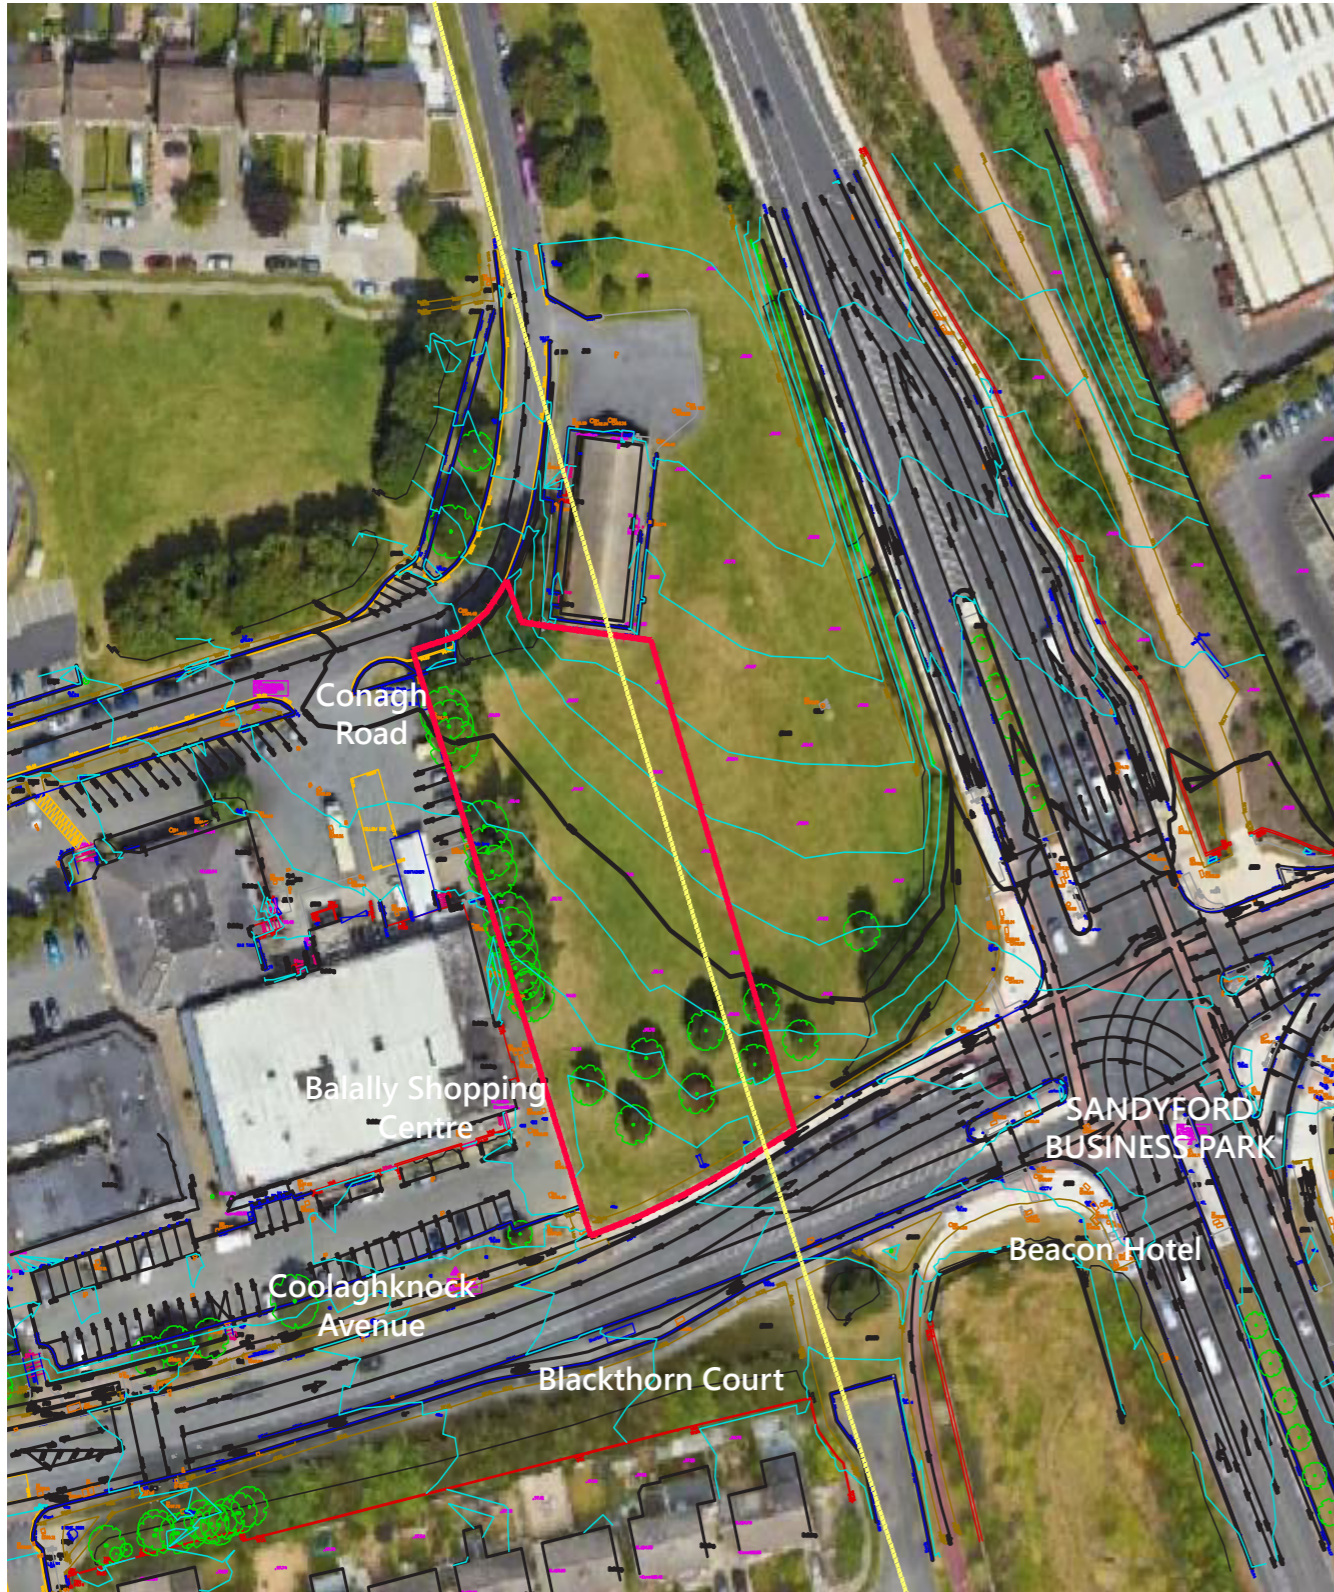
Existing site layout with site outlined in red. Yellow line indicates position of strategic road reservation
